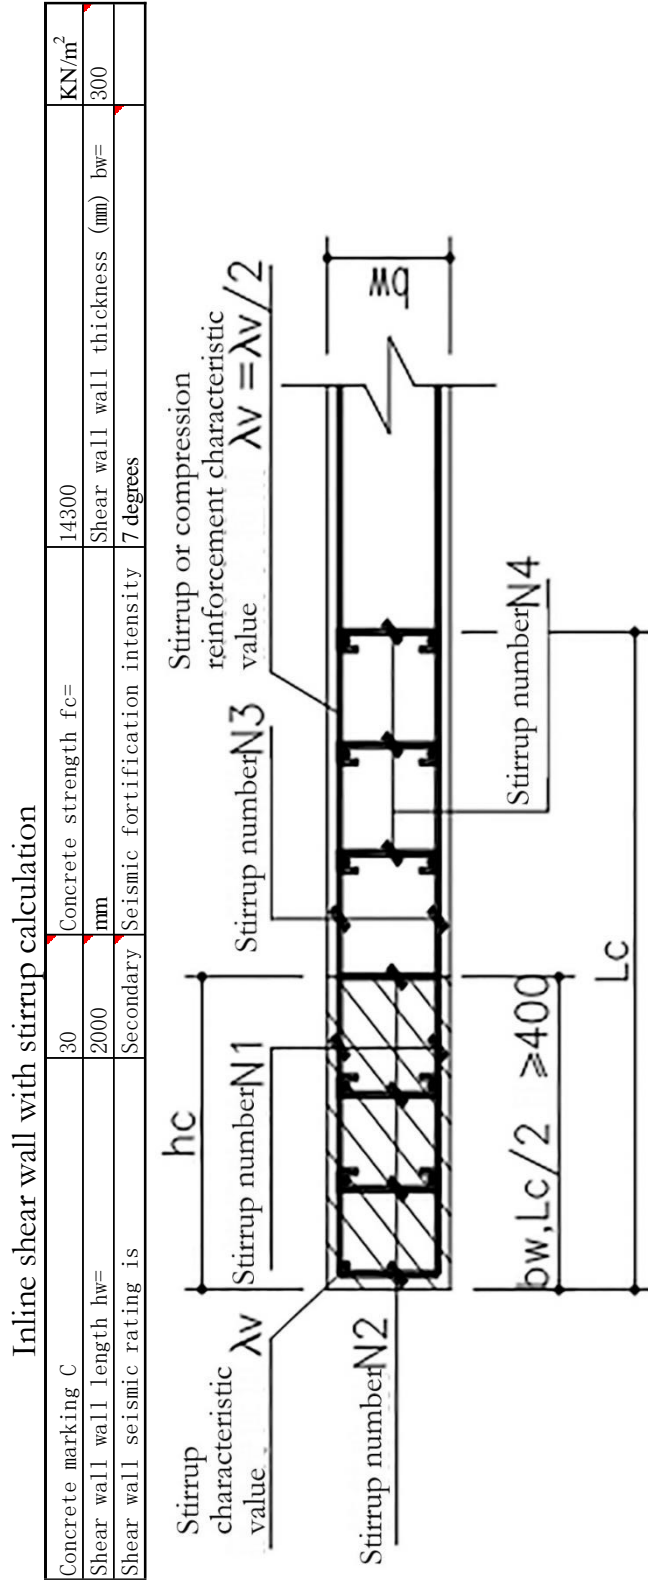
Inline Shear Wall Calculation with Stirrups
